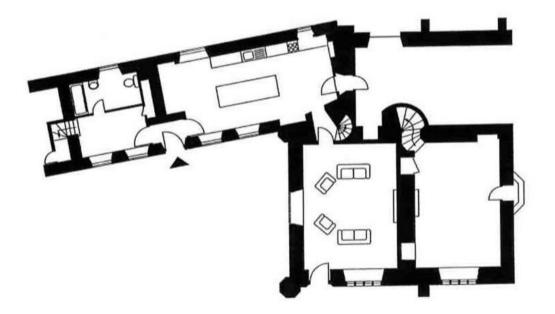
Ground floor plan with current Landmark Trust room arrangements.
